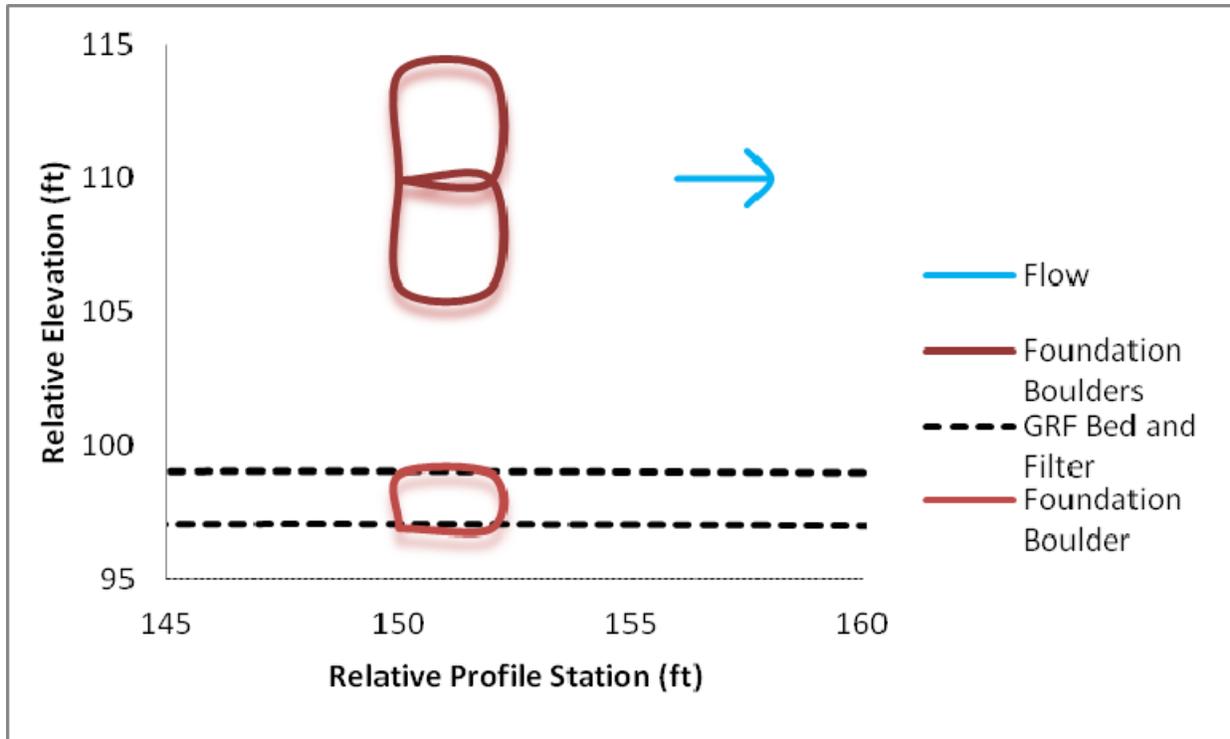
First step in the construction of a boulder cluster: foundation boulders.
